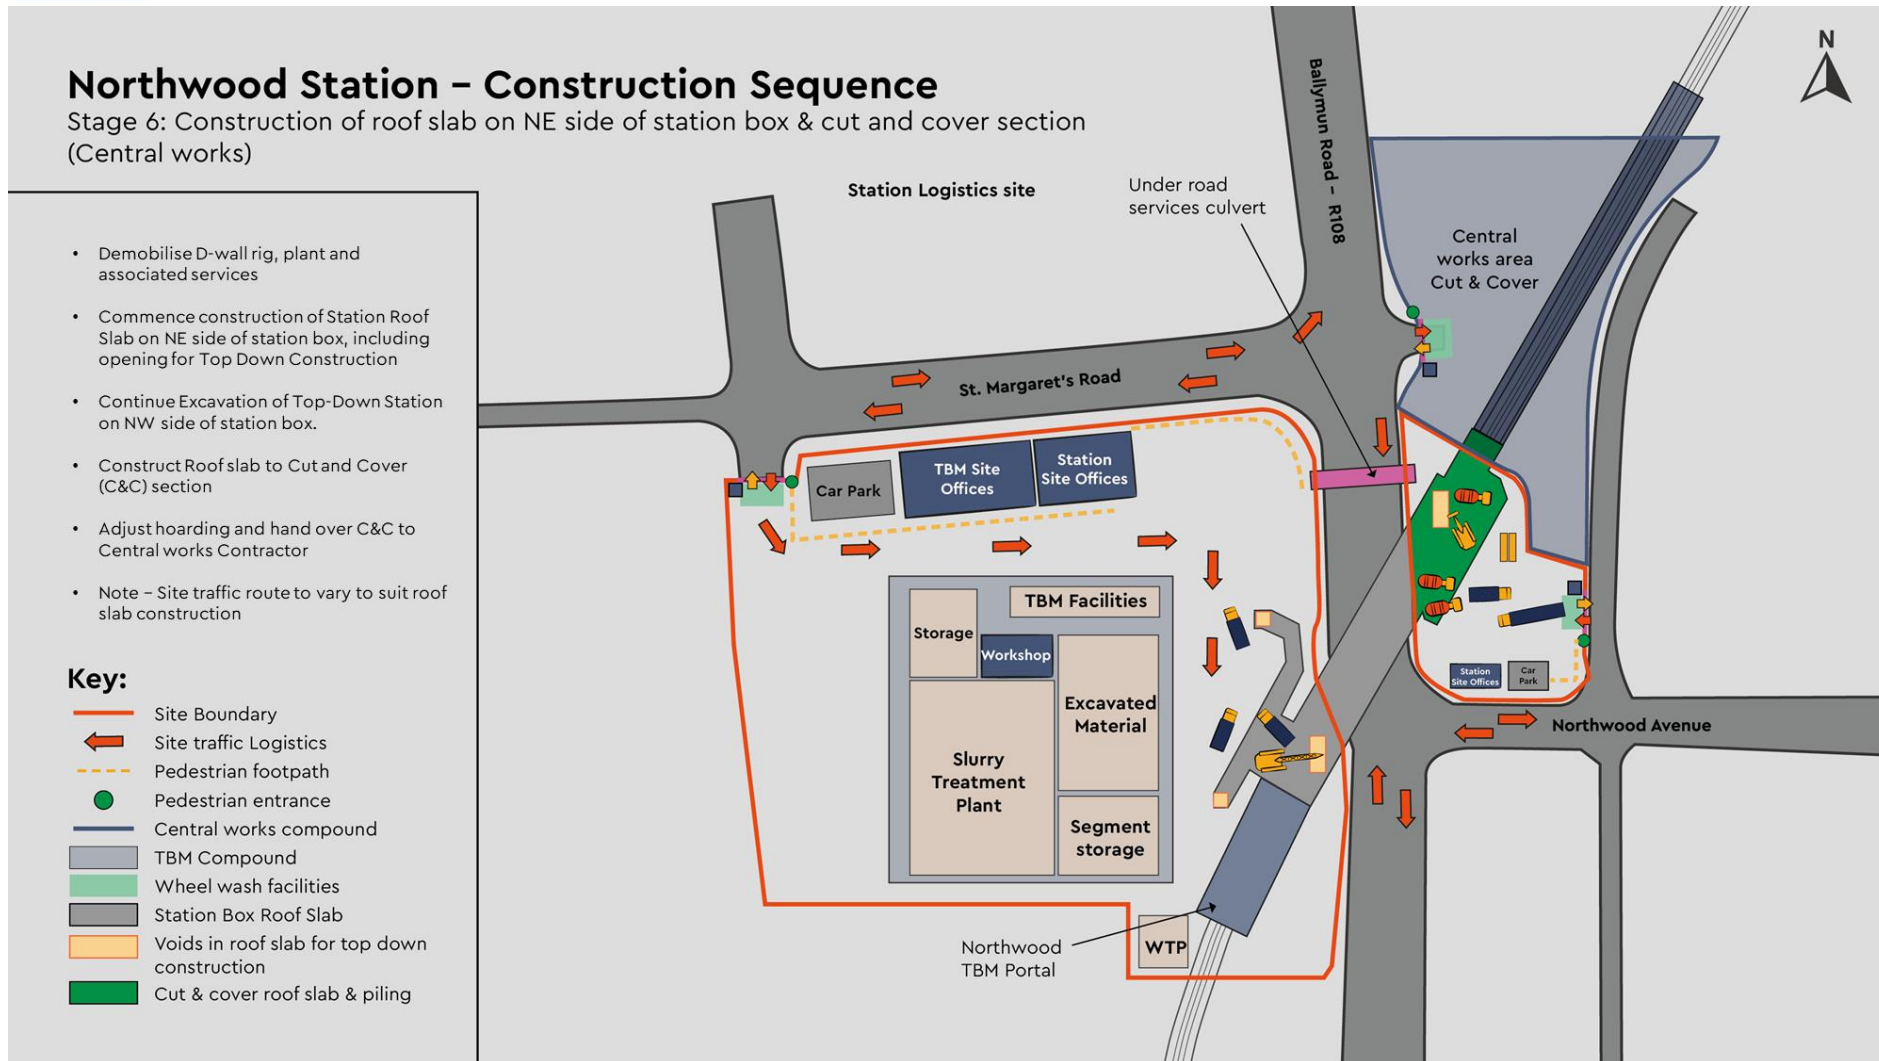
Northwood Station and Portal Stage 6 - Construction of Roof Slab
